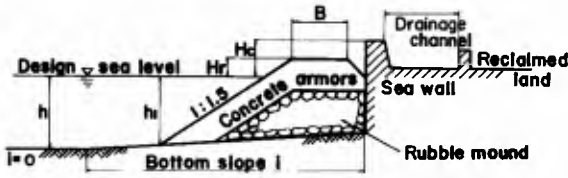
CROSS-SECTIONS TYPICAL TYPES OF SEA-WALL IN JAPAN
